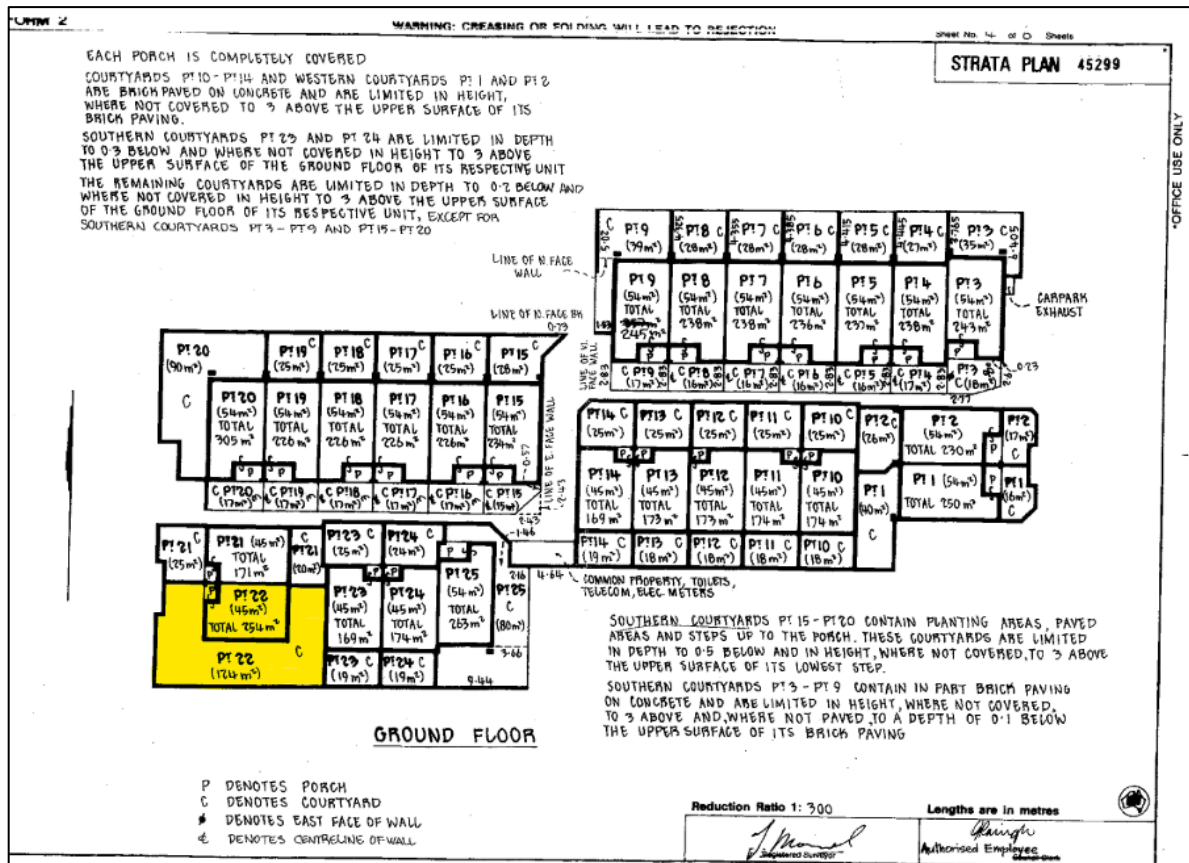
Strata Plan 45299 with Unit 22 highlighted.
